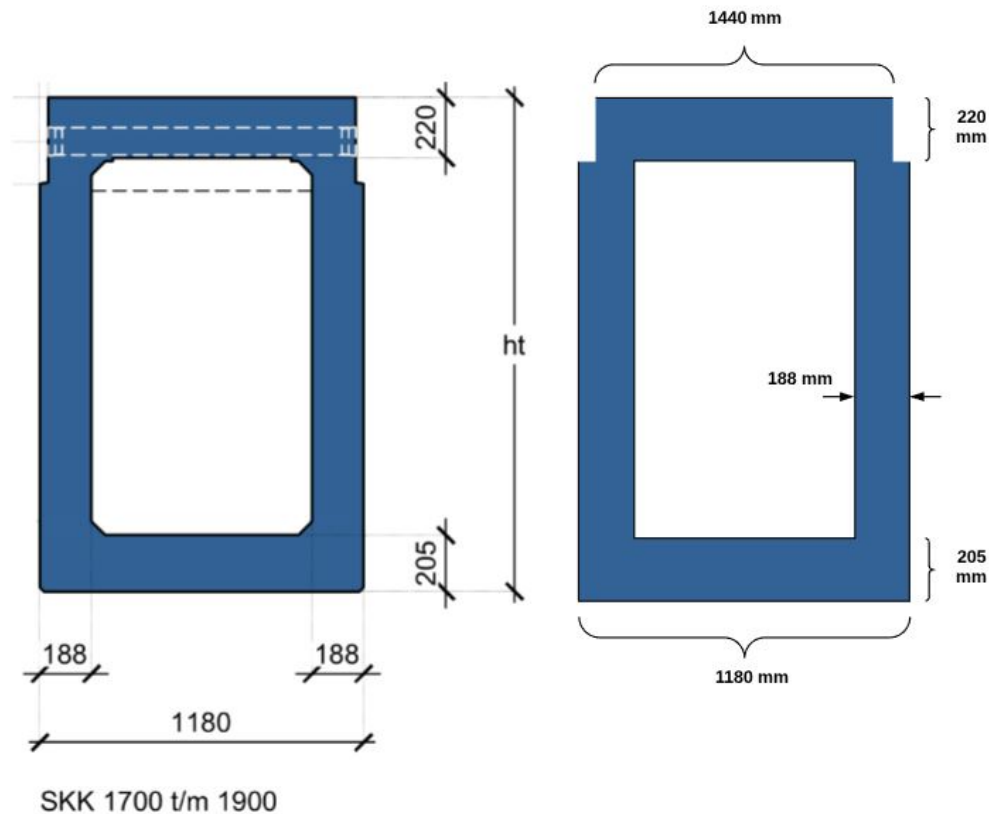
Cross-sections SKK beams for the approach bridge, real and simplified. Source: Spanbeton
